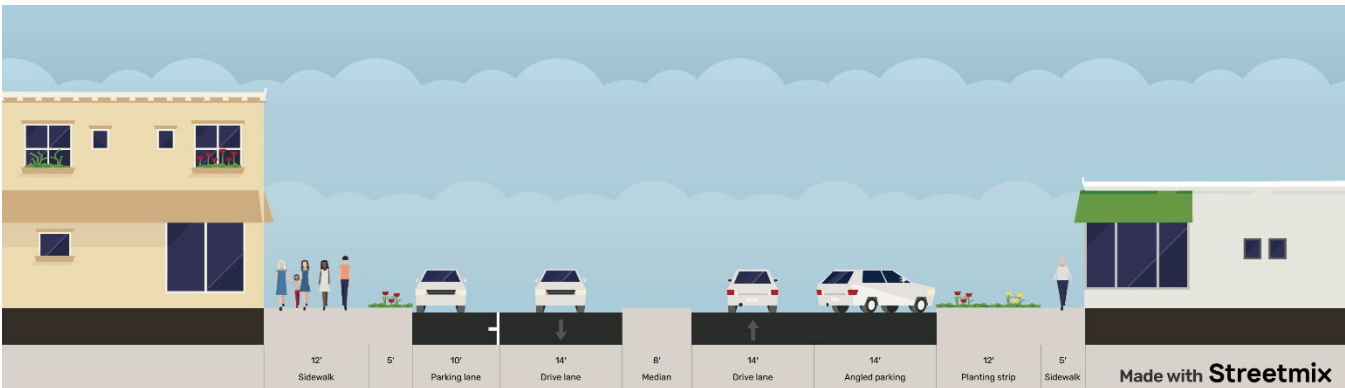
RECOMMENDED MAIN STREET CROSS SECTION BETWEEN US 40 AND 4TH STREET
